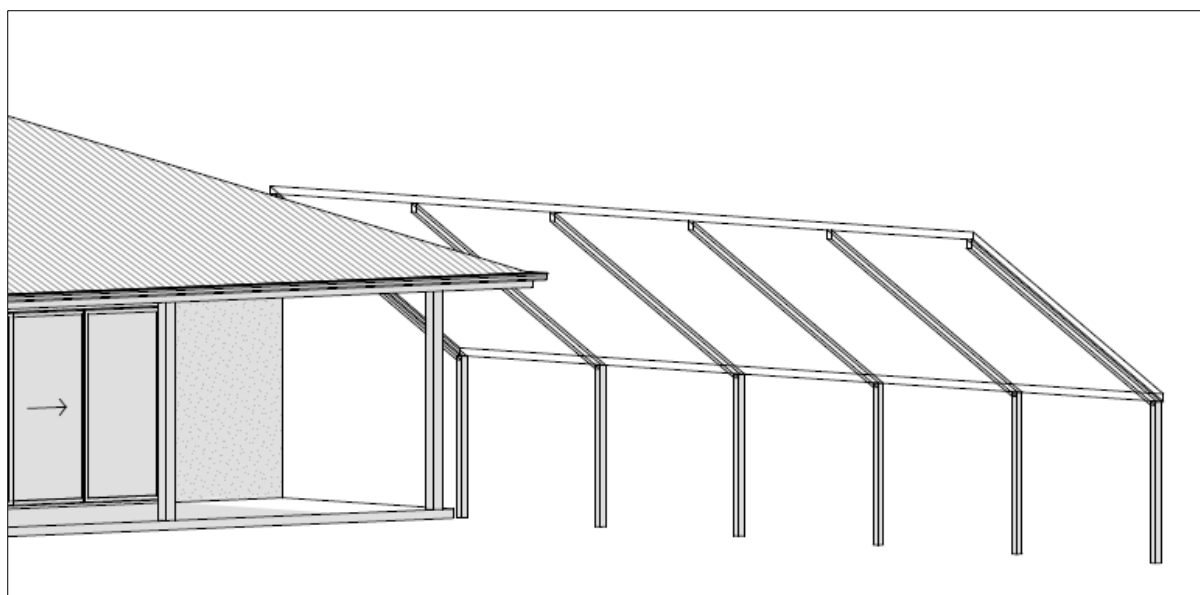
Proposed acoustic fence/roof at western boundary Source: Architectural Plans
